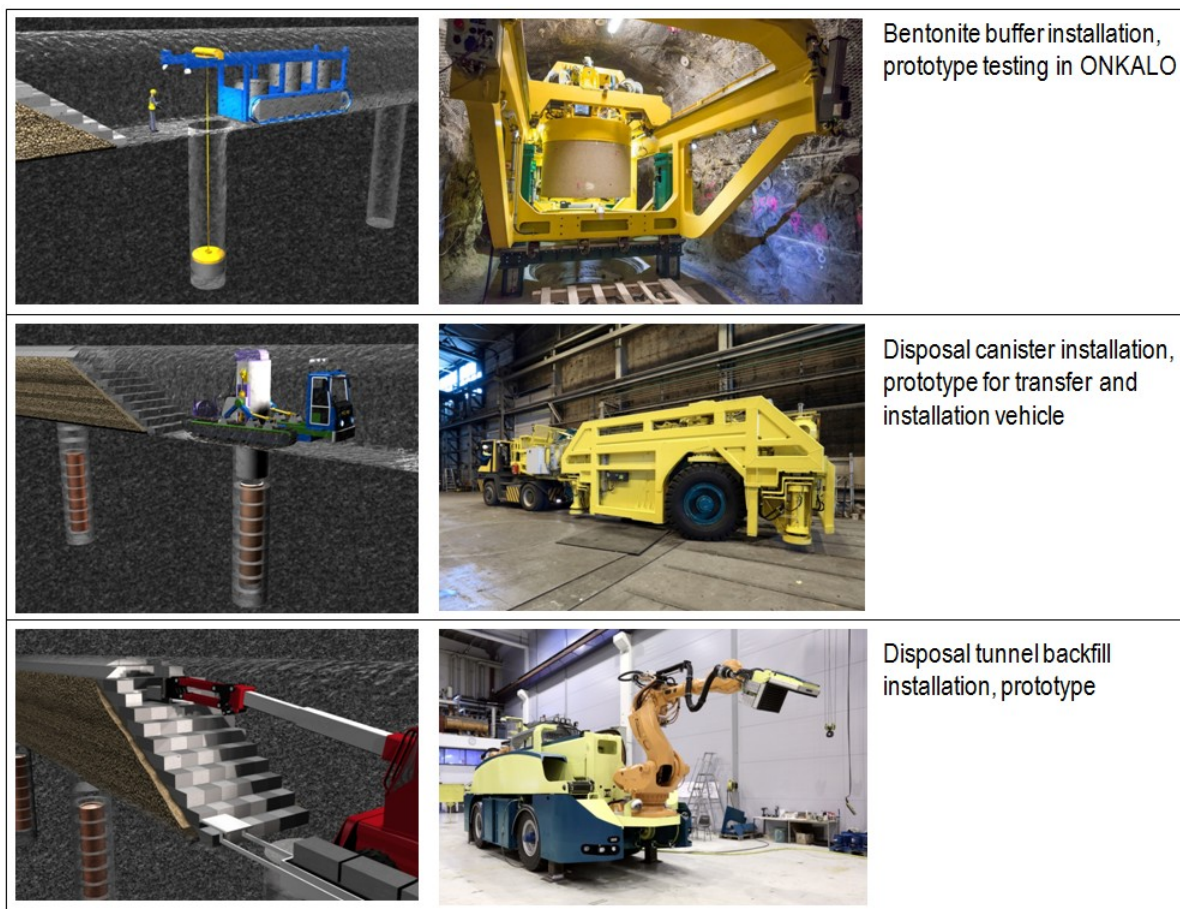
Posiva's prototype machinery for the installation of engineered barrier system. The prototype tests for bentonite buffer, disposal canister and tunnel backfill installation continue in the demonstration tunnels in ONKALO.
